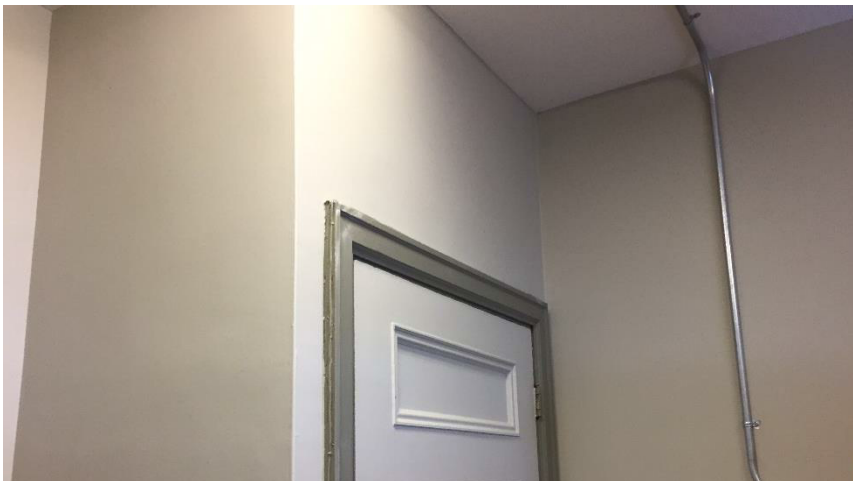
View of low-level lead containing paint and view of asbestos-containing drywall joint compound observed throughout the subject building.
